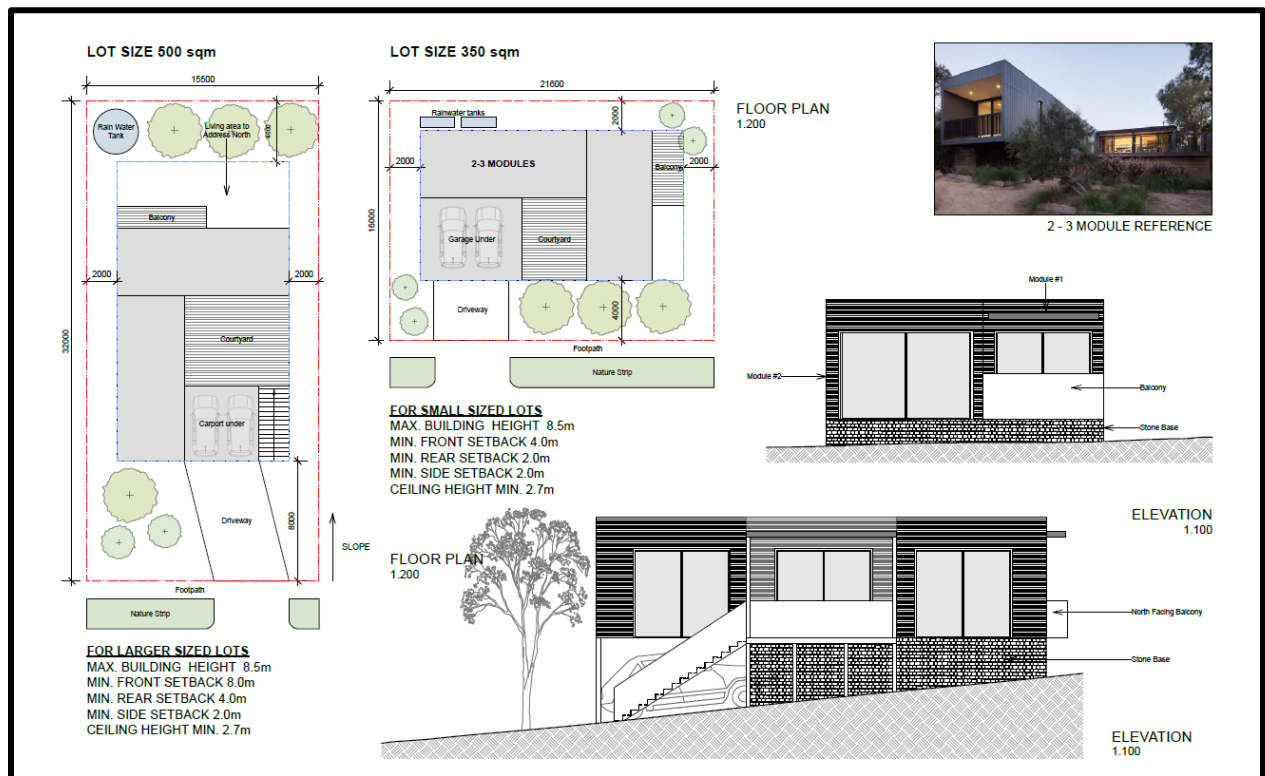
Typical Detached Dwelling (Source: Robert Harwood Architects)
